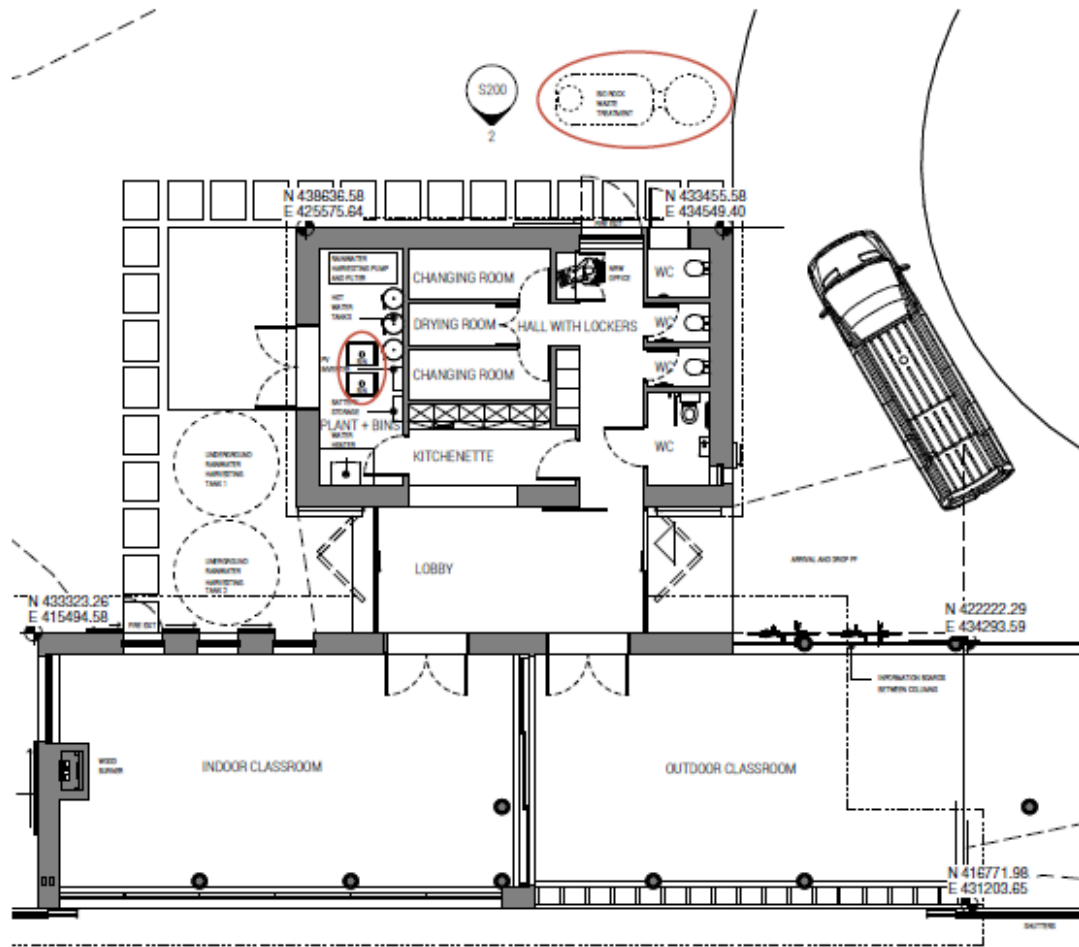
Proposed development block plan, and ground floor plan of new classroom facility
